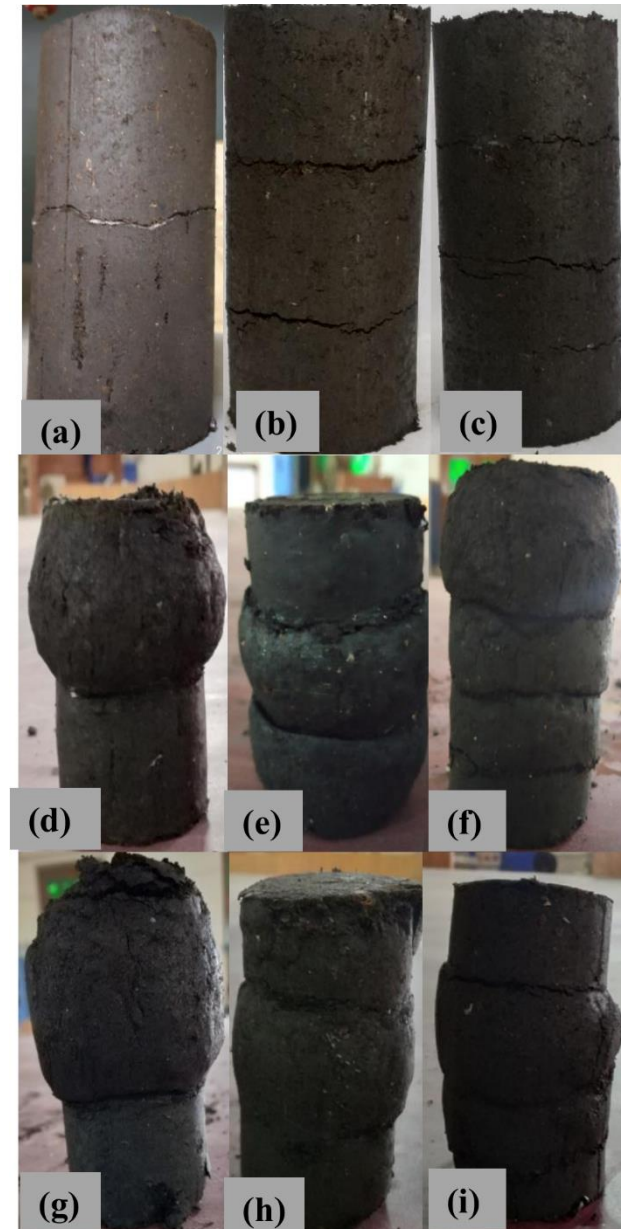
Sample images (a) 1-layer reinforcement, (b) 2-layers reinforcement, and (c) 3-layers reinforcement before failure, and failure pattern images of sample for (d) 1-layer geotextile reinforcement, (e) 2-layers geotextile reinforcement, (f) 3-layers geotextile reinforcement, (g) 1-layer geonet reinforcement, (h) 2-layers geonet reinforcement, and (i) 3-layers geonet reinforcement at confining pressure of 150 kPa
